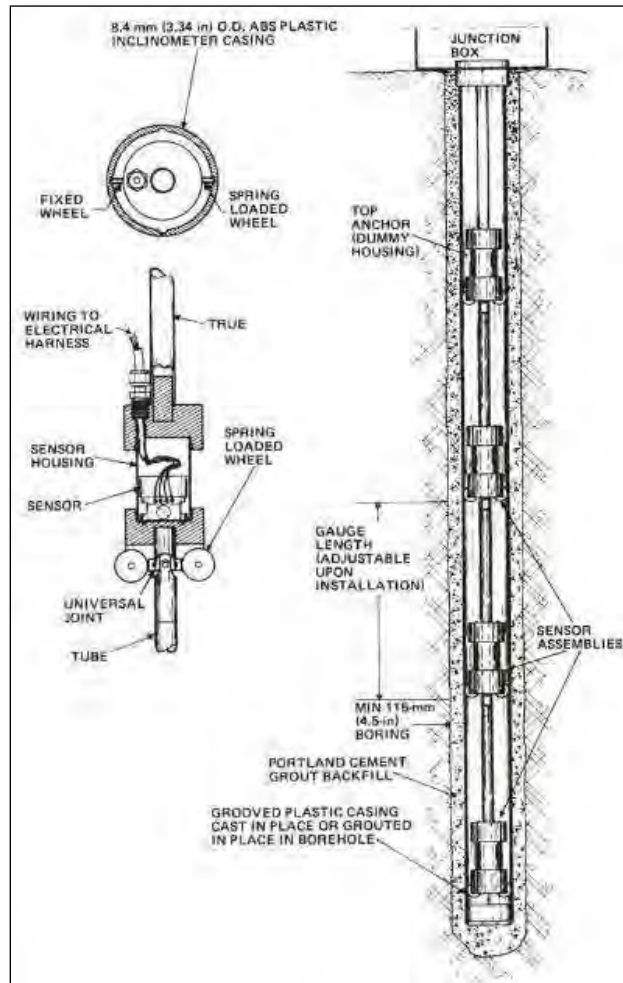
Installation and Detail of Multi-Position In-Place Inclinator [142]
